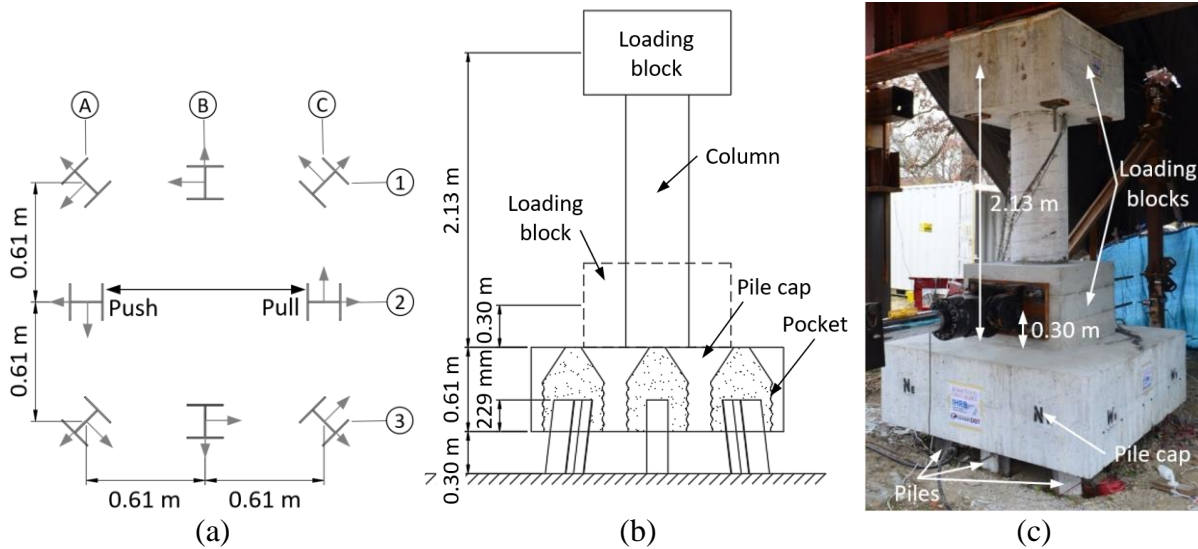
Pile group layout: (a) pile configuration; (b) pile cap, column, and loading blocks; (c) photograph of the pile cap and loading blocks
